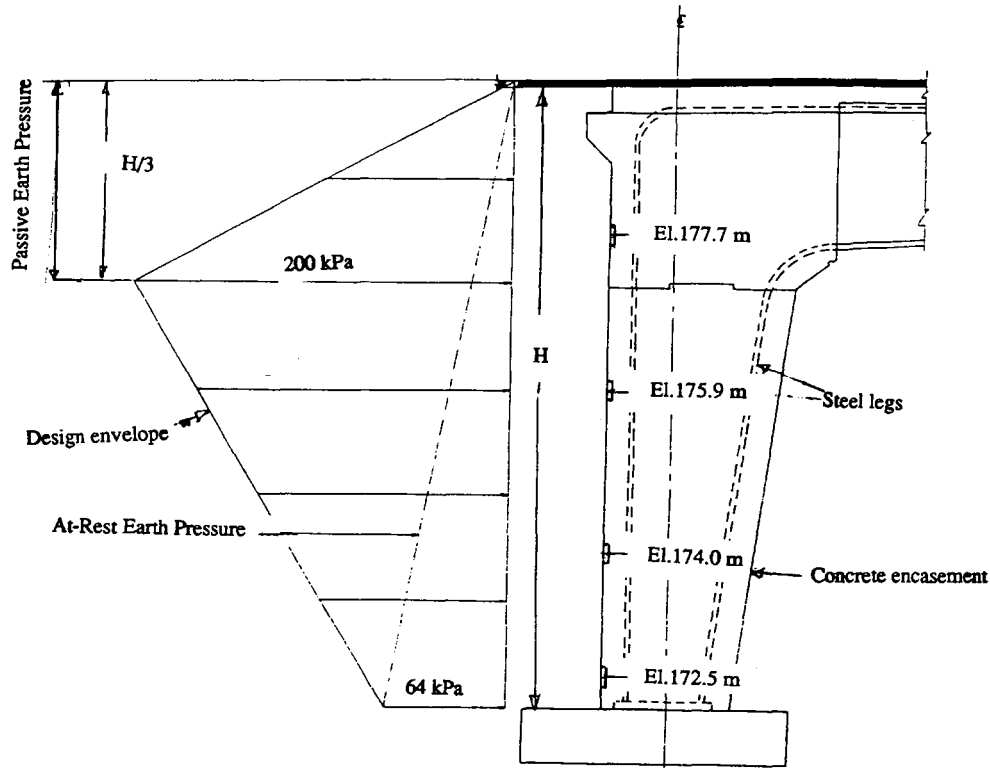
Design earth pressure for The Forks Bridge [after Roberts (10)].
